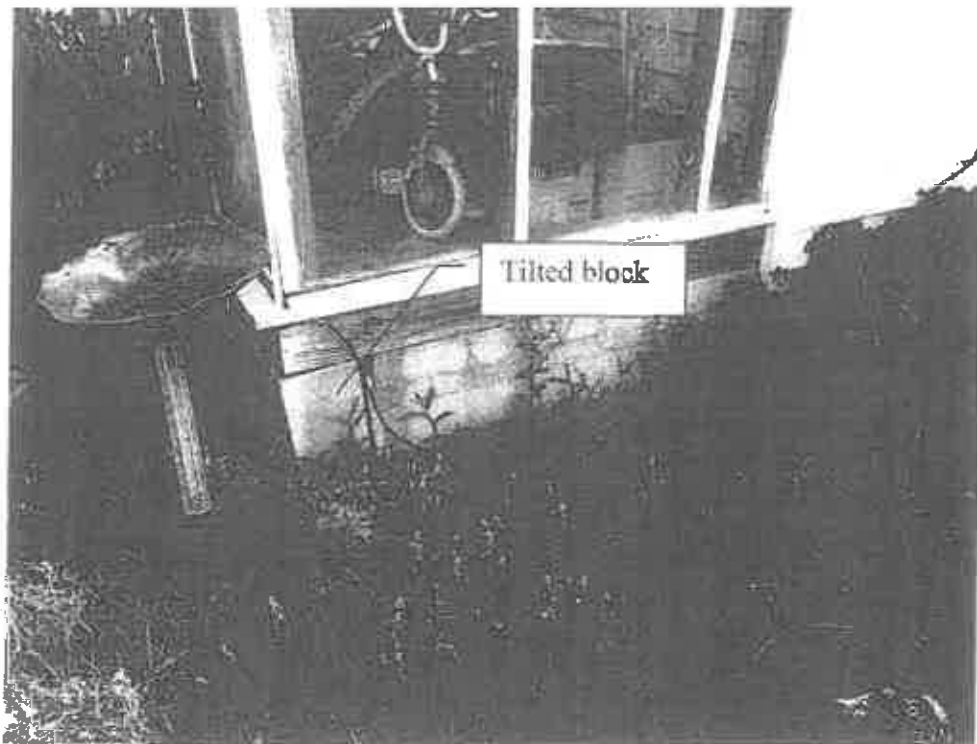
Skewed Window Frame at Kitchen Rear Wall
